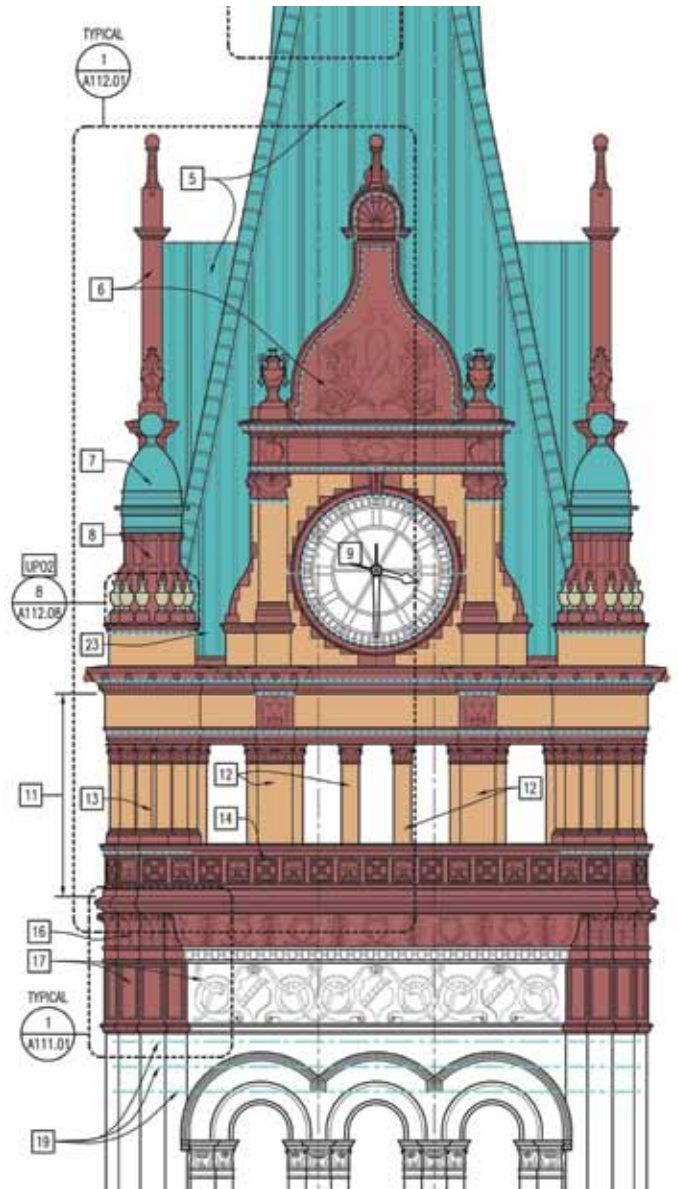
Scope of work elevation for the South Tower. New relieving angles are located at all new flashing locations (shown as horizontal blue dashed lines).
